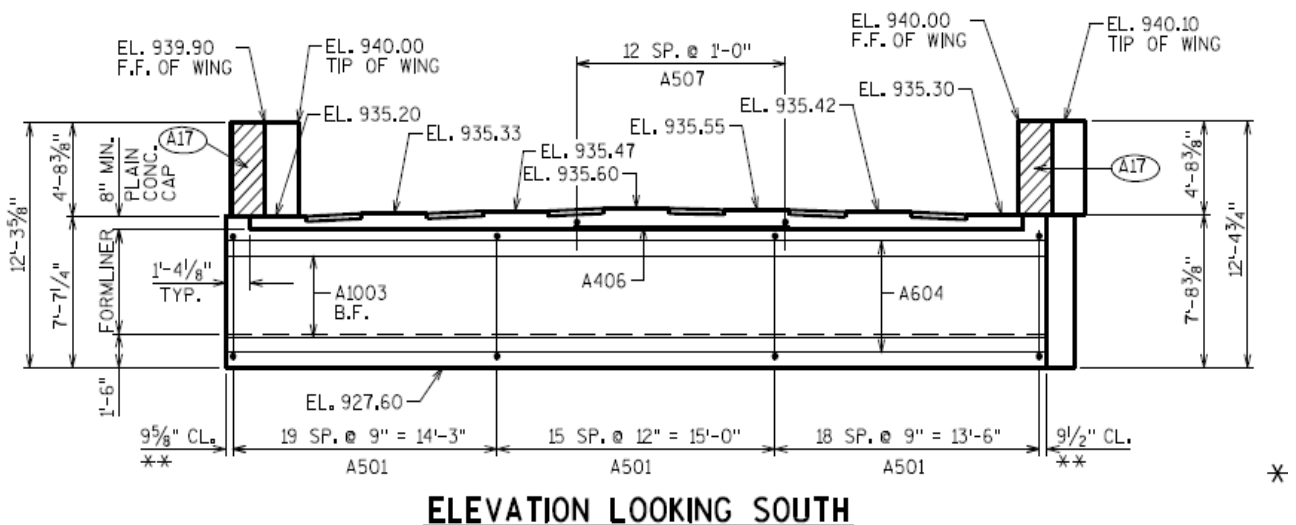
Bridge plans from Highway 51 at Bear Tree Parkway (top). Shown here in the beam seat plans is the elevation of the abutment face with the parapet wall.
